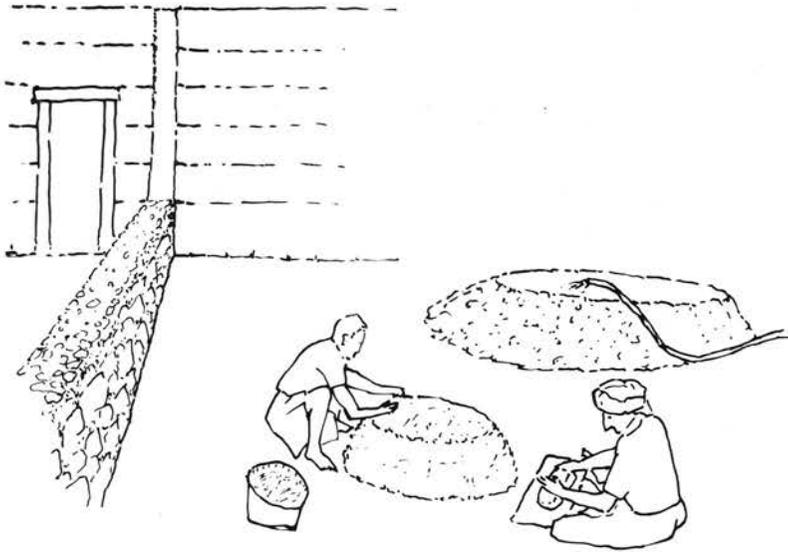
Rebuilding a collapsed garden wall in San'a in traditional construction; left: sode of random rubble; right: mud mix and preparation of clay ball units
